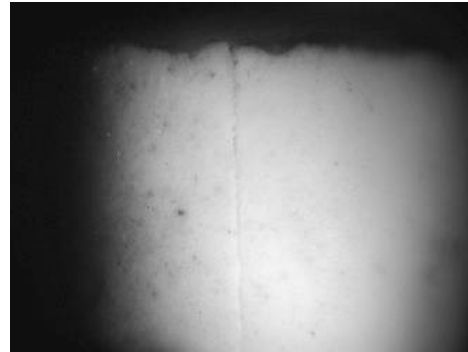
Crack originated at the specimen end causing vertical splitting in the specimen.
